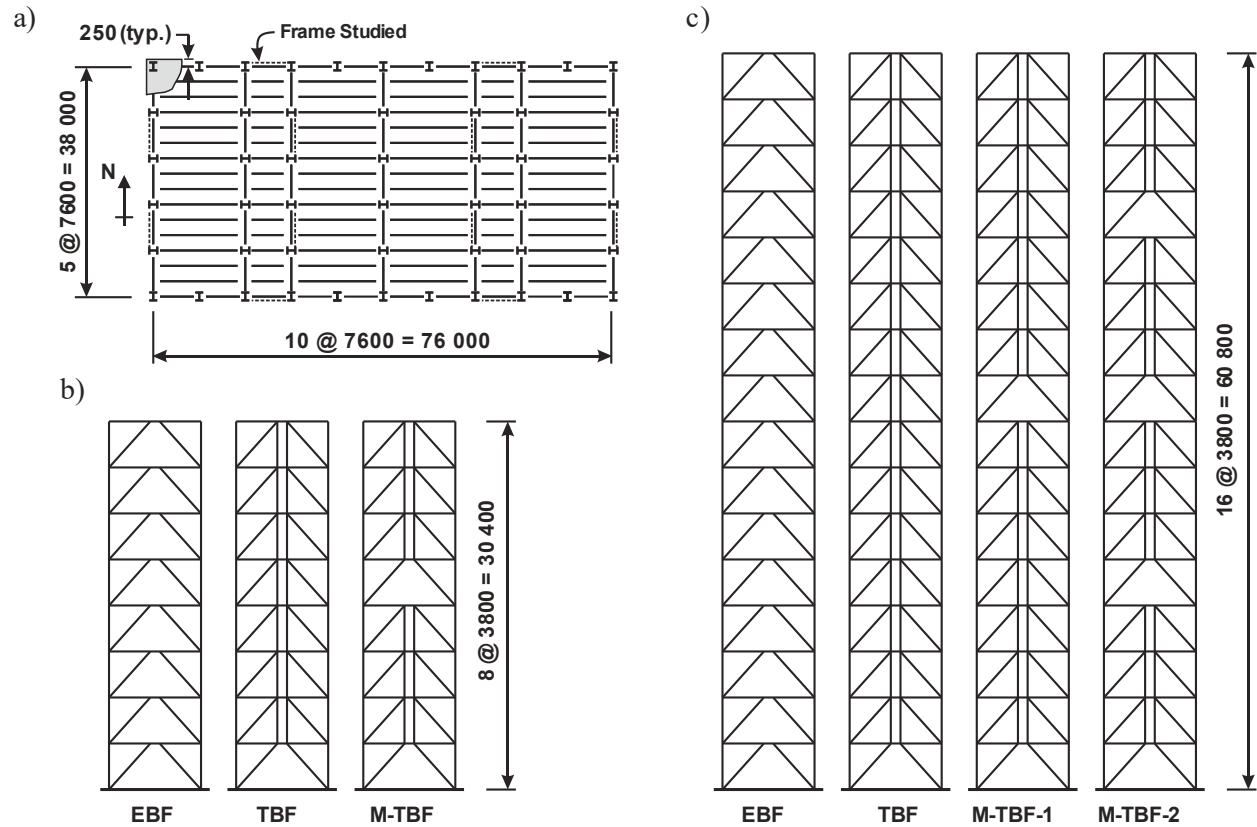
a) Floor plan of the building studied; b) Elevation of 8-storey framing systems; c) Elevation of 16-storey framing systems.
